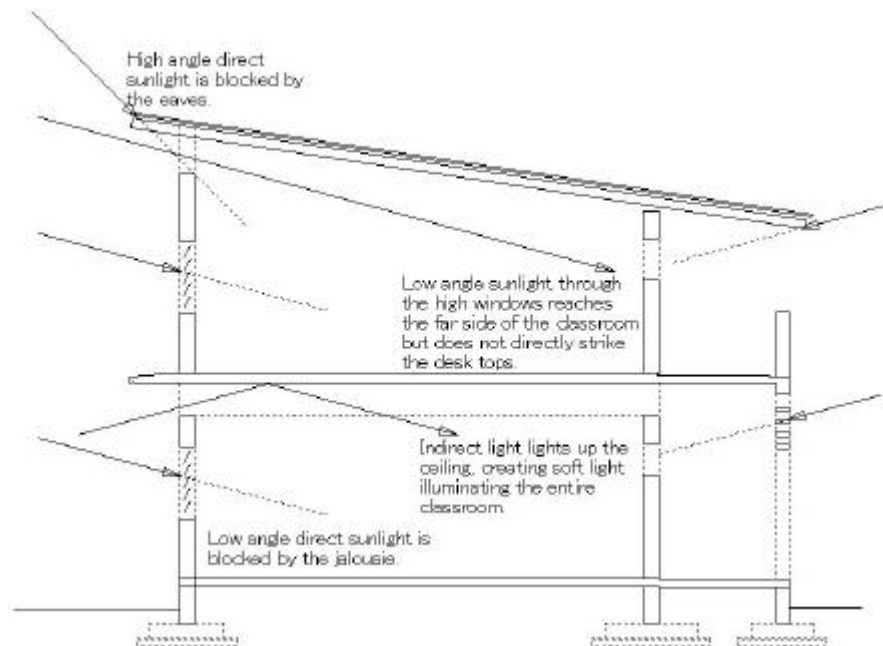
Planning Concept for Section for Two Story Classroom Building
